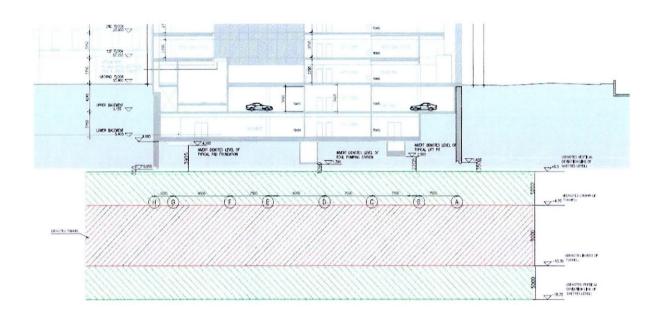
Proposed Metrolink Tunnel Route against Existing Double Basement Structure
